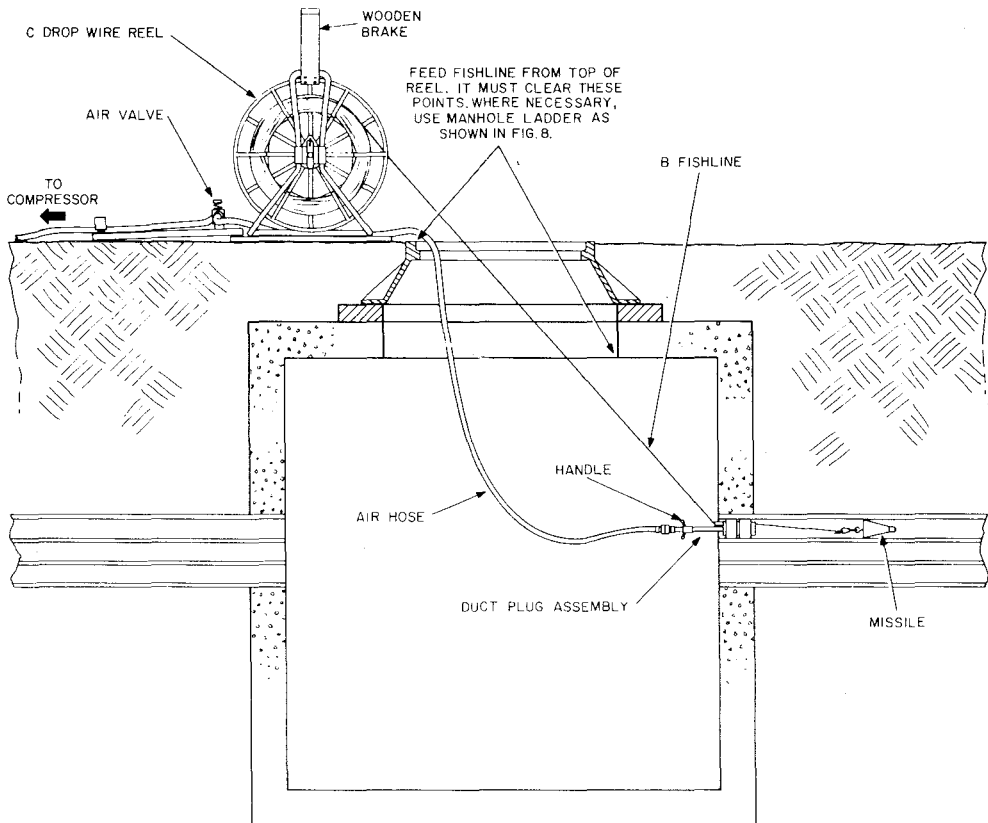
Duct Plug Assembly in Duct—Using Reel
